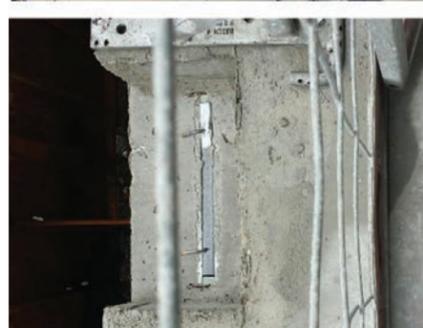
Pictures of Conditions with Proper Concrete Consolidation at the Anchorage Zone.
